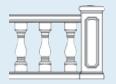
Noble1 Binelli2 Verona2 Balustrade with Matching Newel Pier
